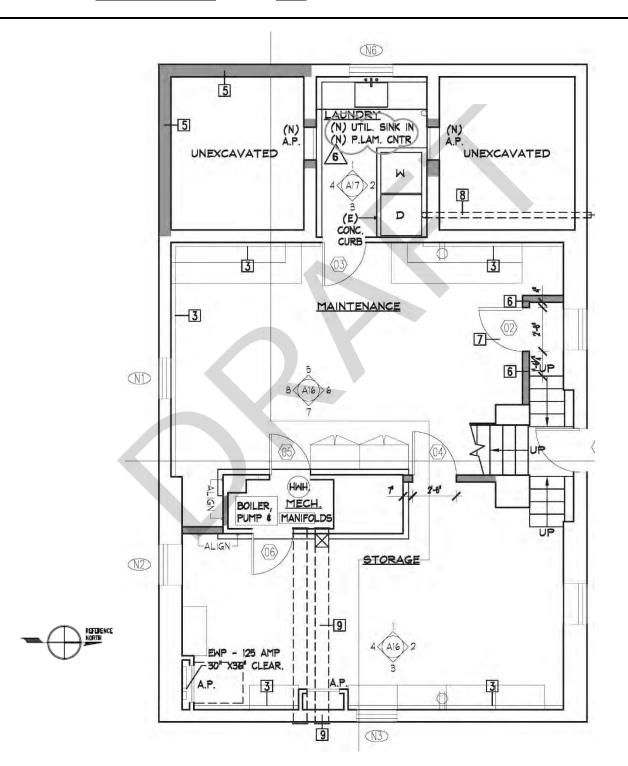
Basement Level Floor Plan (Detail, Drawing A2, Gensler 2011)
